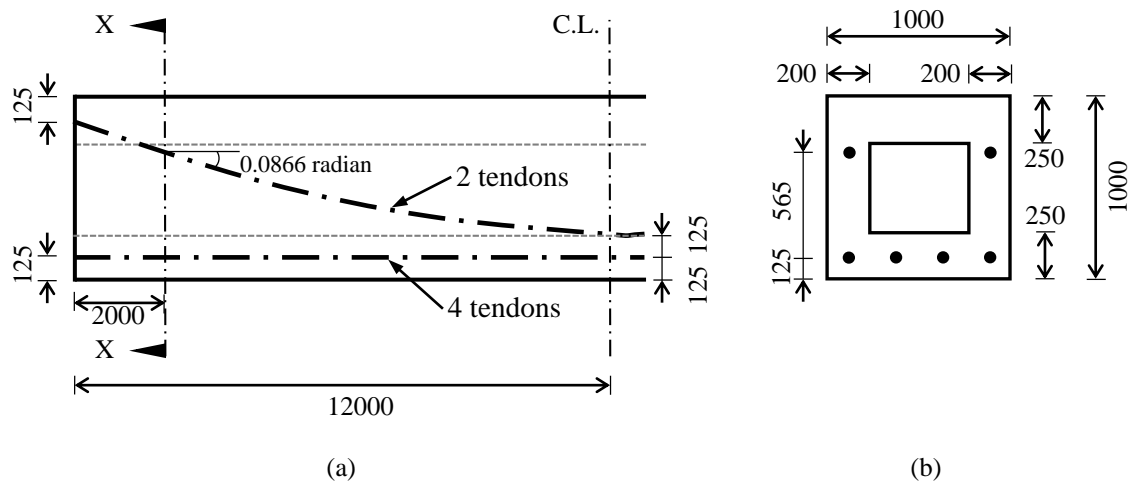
(a) Elevation view of the beam (b) Sectional view of X-X
